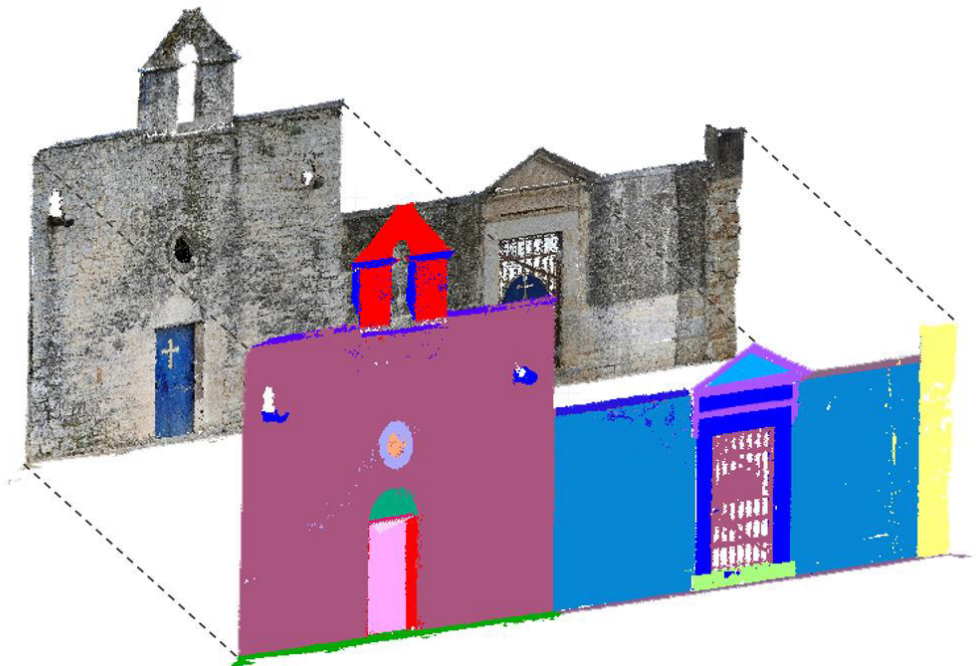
Application of the RANSAC to the dense point cloud of façade Est of rural church of Santissimo Salvatore.
